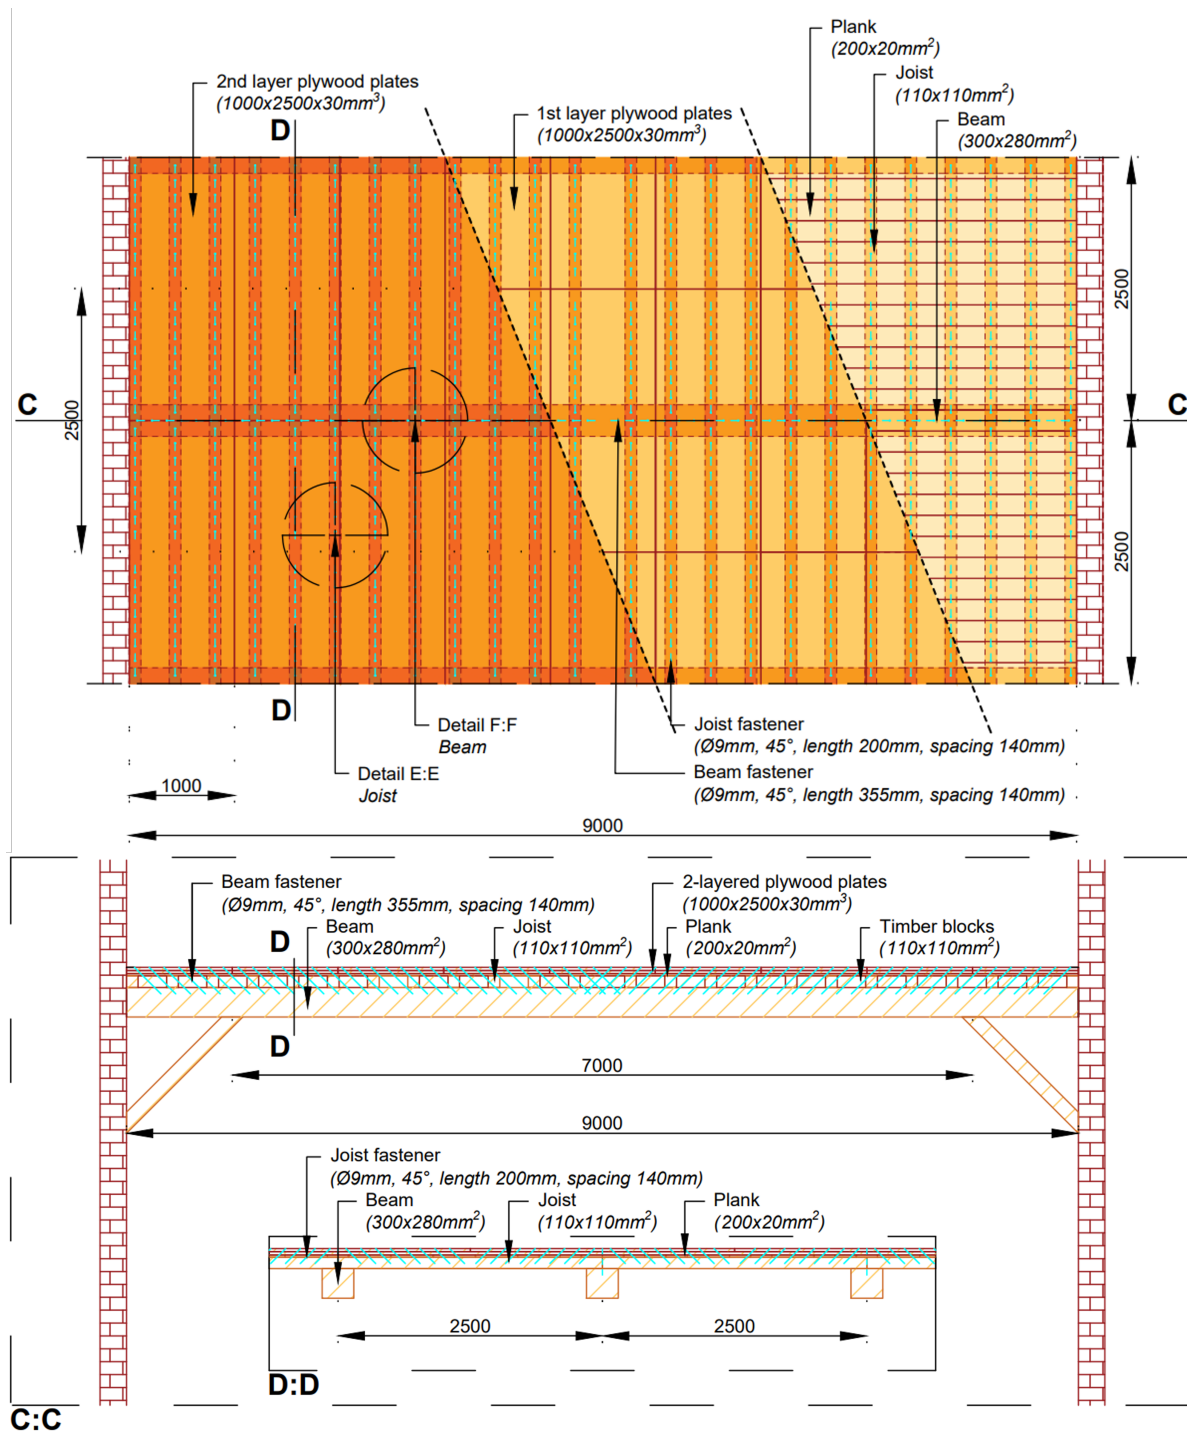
Top and side view of the attic floor after strengthening the joist direction
